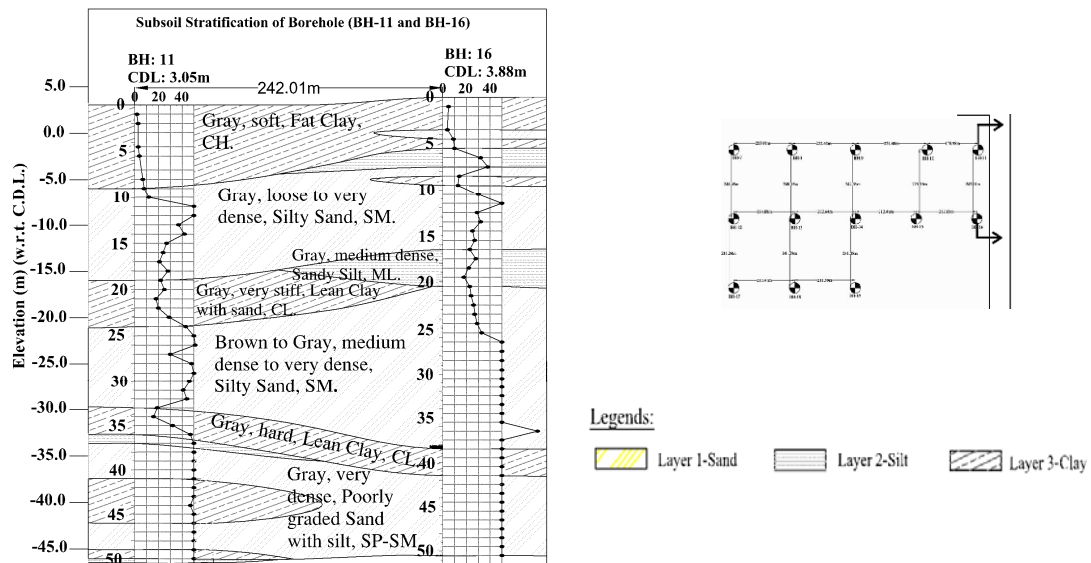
Subsurface section (BH-11~BH-16)
